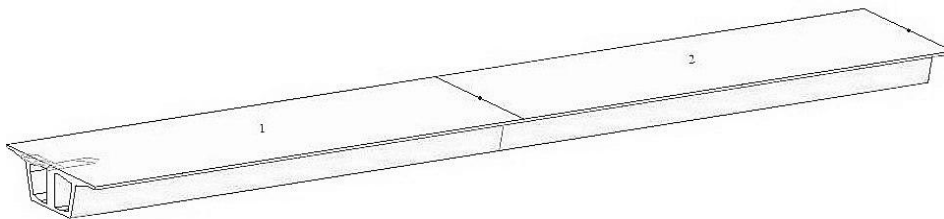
Typical 3D view of 70m continuous RCC Box Girder Bridge deck
